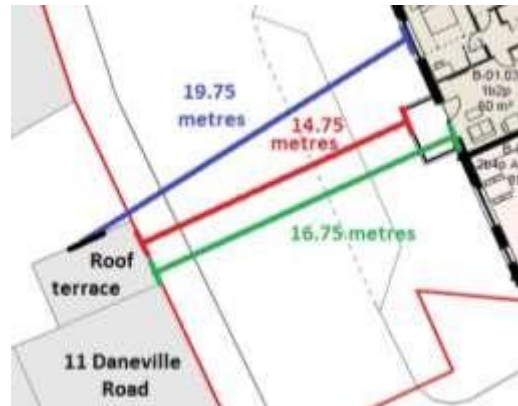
Proposed plan showing the shortest window-to-window distance (blue), as well as the distances to the roof terrace from the nearest proposed window (green) and the nearest proposed balcony (red).
